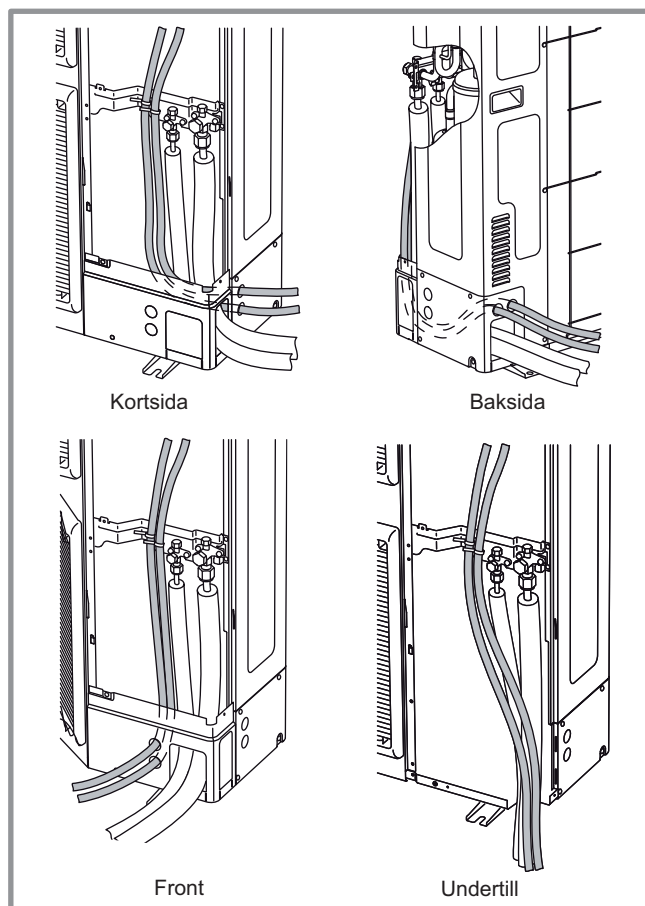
Location of electrical cables and refrigeration connections to outdoor unit
